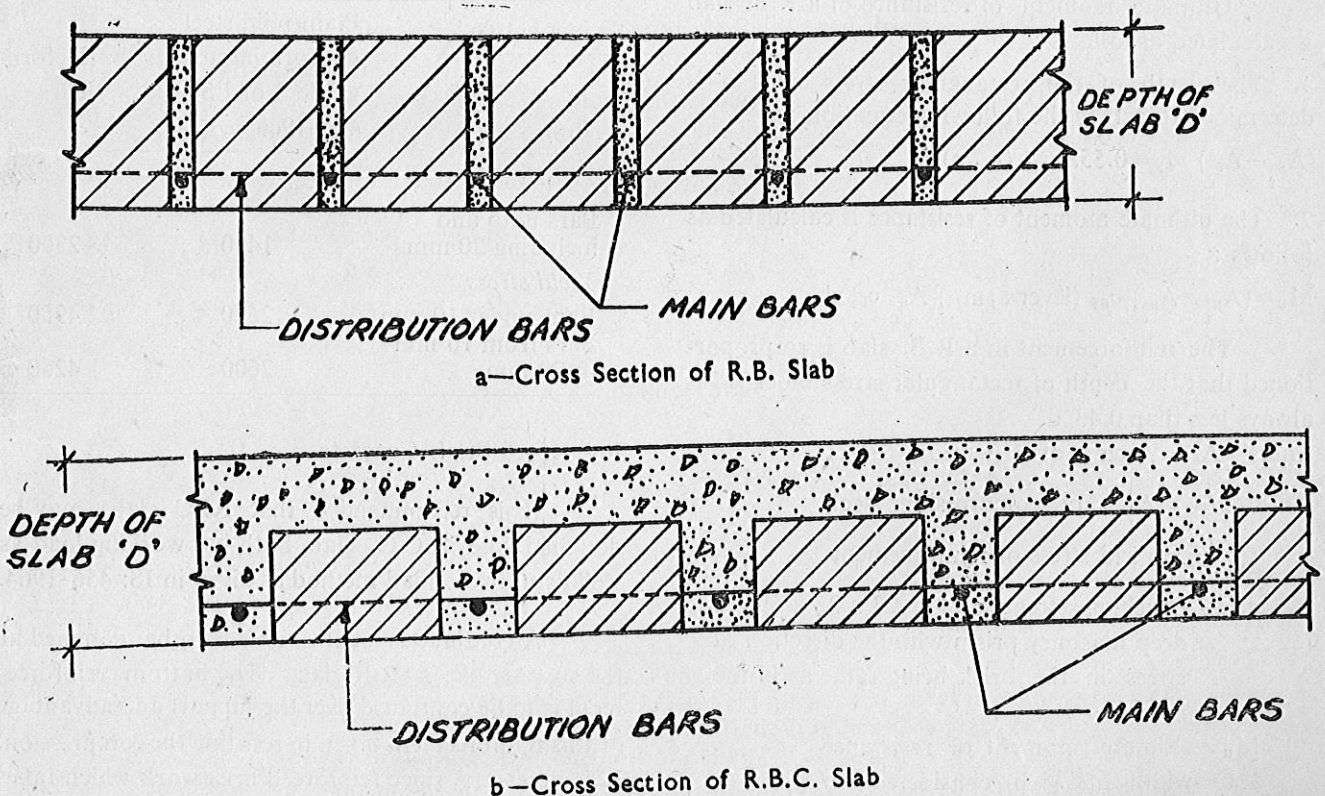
Reinforced Brick and Reinforced Brick Concrete Slabs
